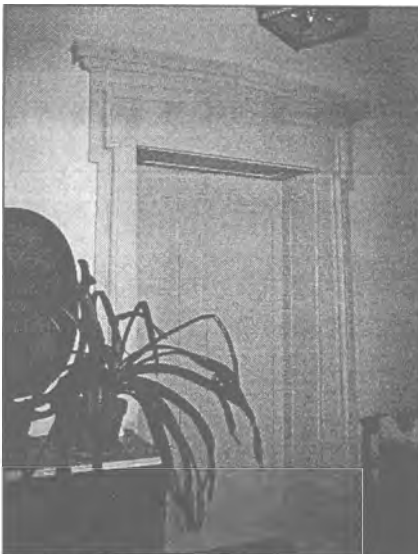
Main dwelling, interior of central passage showing door surround to parlor
